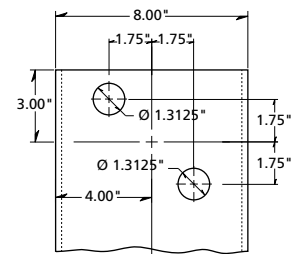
DETAIL POST ASSEMBLY 6 x 4 SIDE ELEVATION
